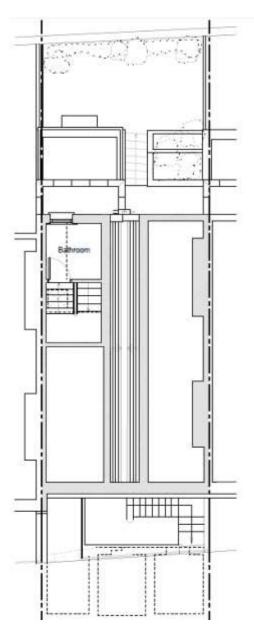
Plan of mezzanine level. There is a bathroom in the rear of one part of the roof. The rest of the roof space is boarded off as attic storage and is not habitable.
